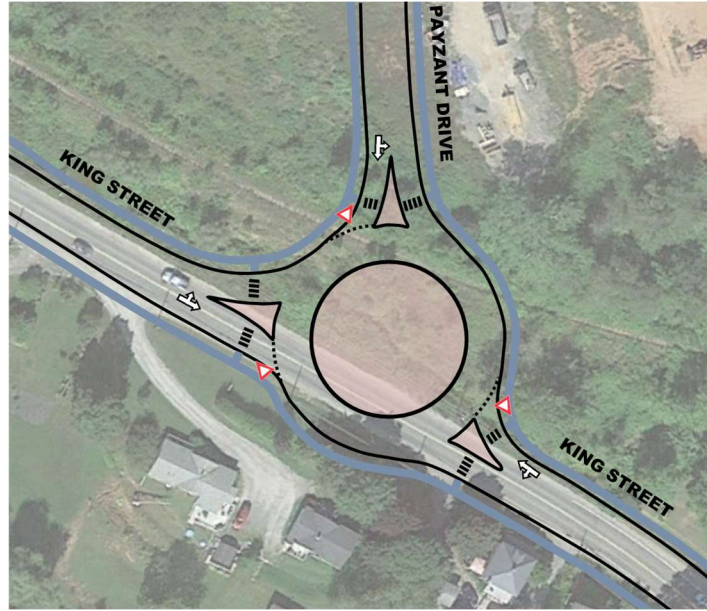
Recommended Roundabout Configuration: King Street at Payzant Dr<sup>6</sup>
